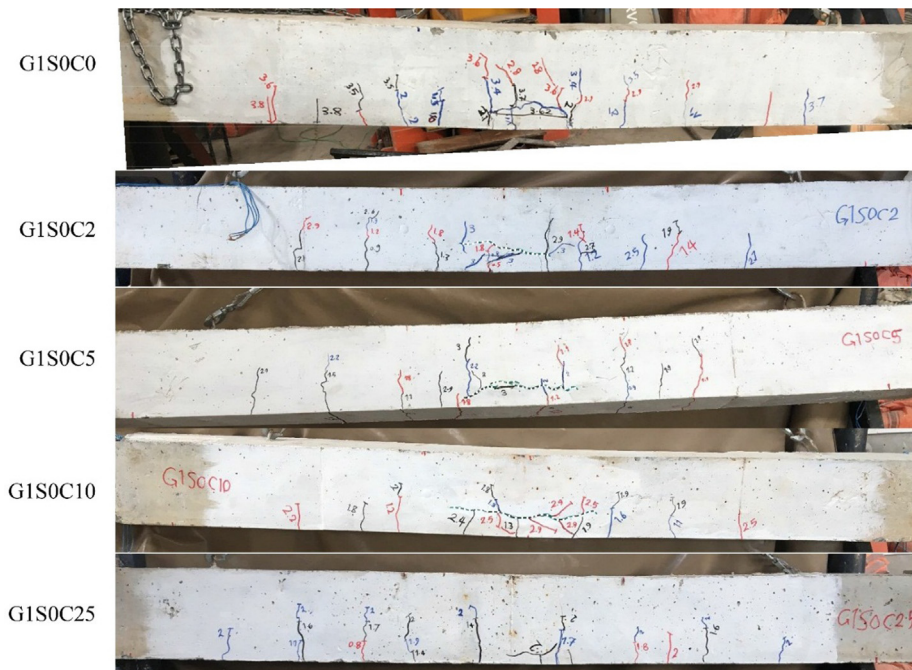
The cracking pattern of specimens without stirrup.
